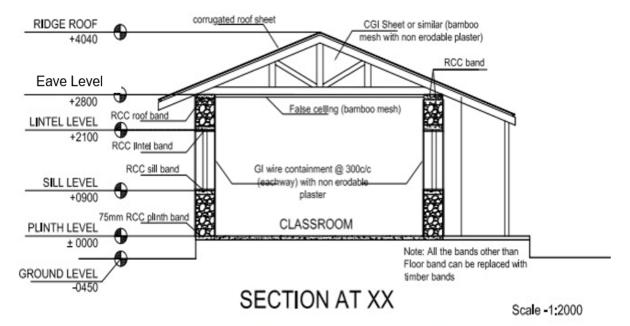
Type Design 1 (SM_RC): Semi-dressed stone masonry in cement stabilized mud mortar with RC band, splints and Galvanized Iron (GI) containment mesh on wall surfaces.
